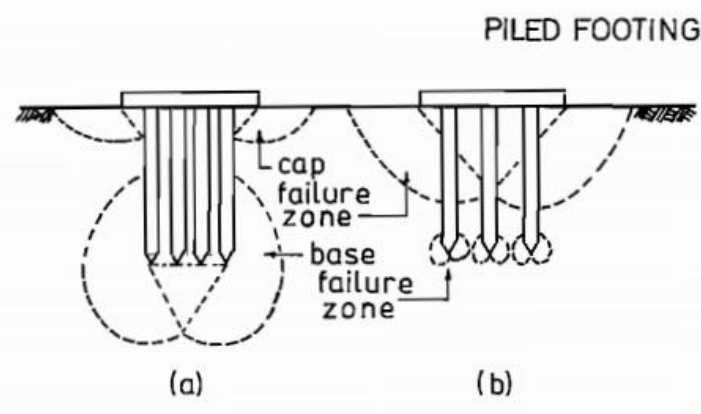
Failure zone of the piled raft foundation (a) equivalent pile failure (b) individual pile failure. (Kishida and Meyerhof 1965).
